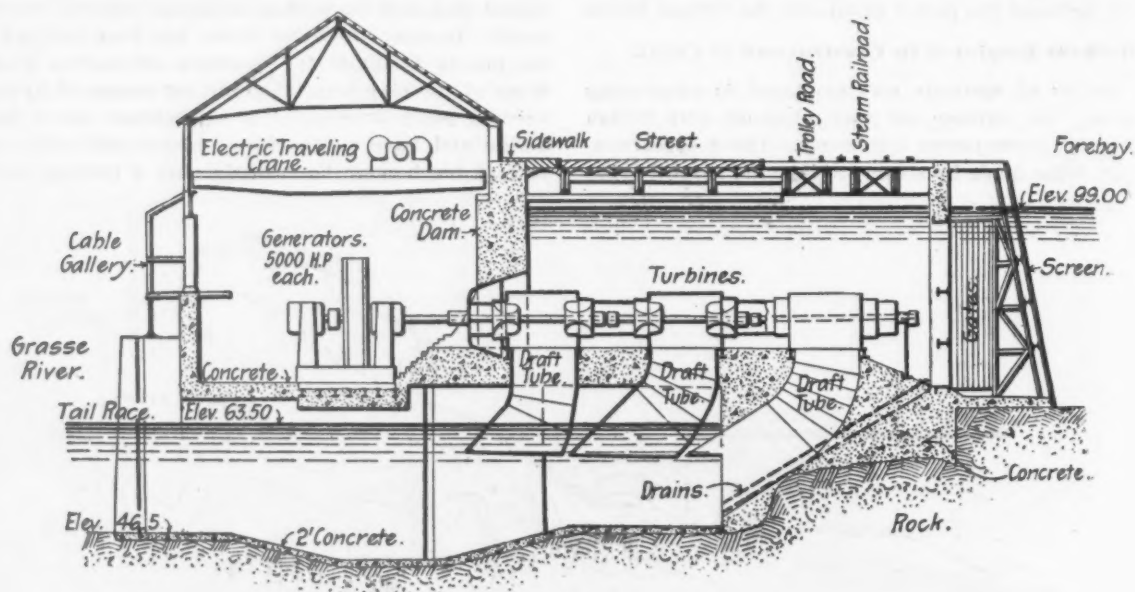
Section Illustrating Arrangement of Generating Set.
